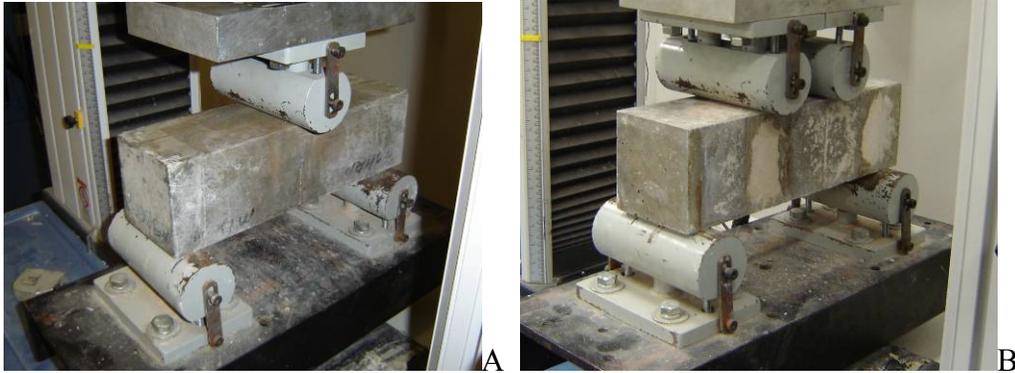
Small beam flexural testing with Instron machine A) 3-pt loading B) 4-pt loading
